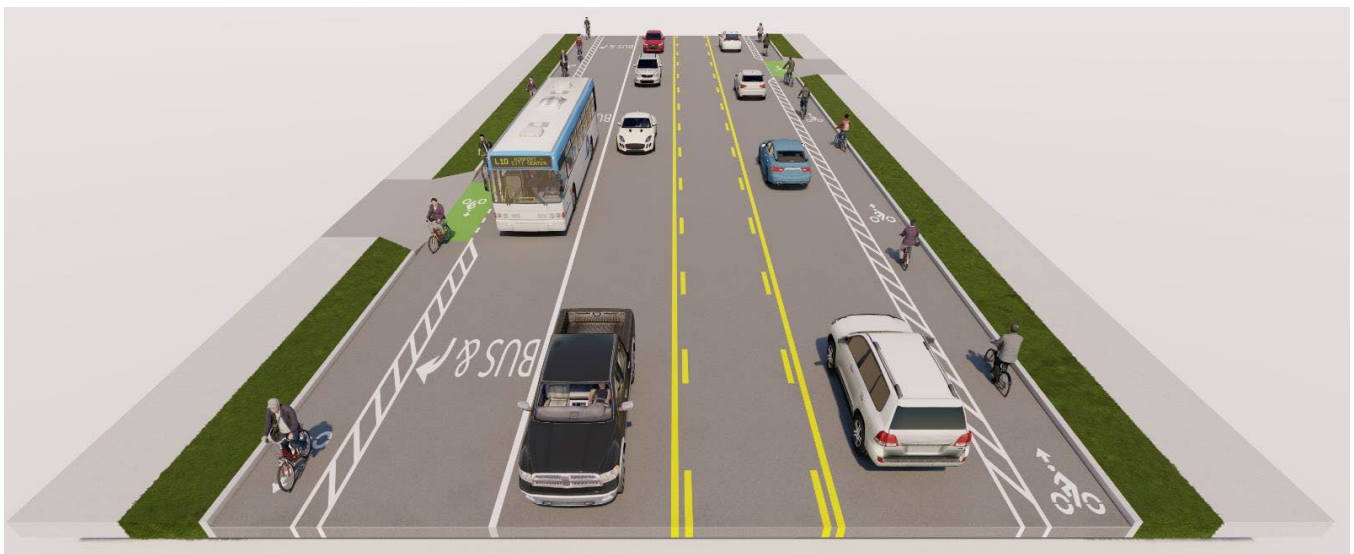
Alternative 2 - Ft. Vancouver Way to Falk Road
